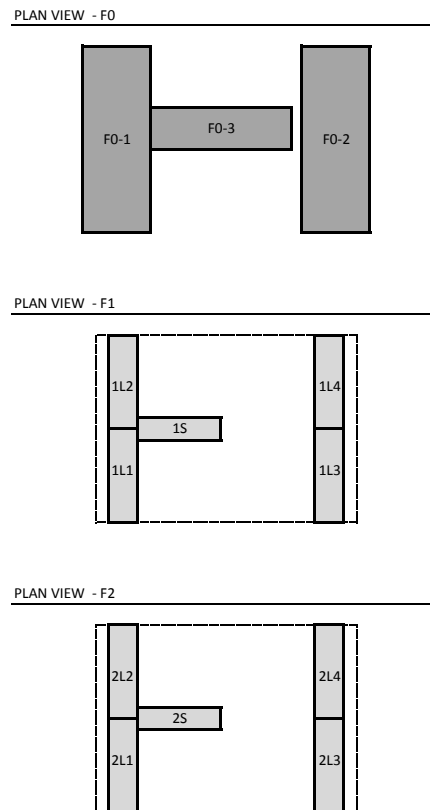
EUC-BUILD4 specimen: reference plan views for instrumentation (ground, first and second floors).
